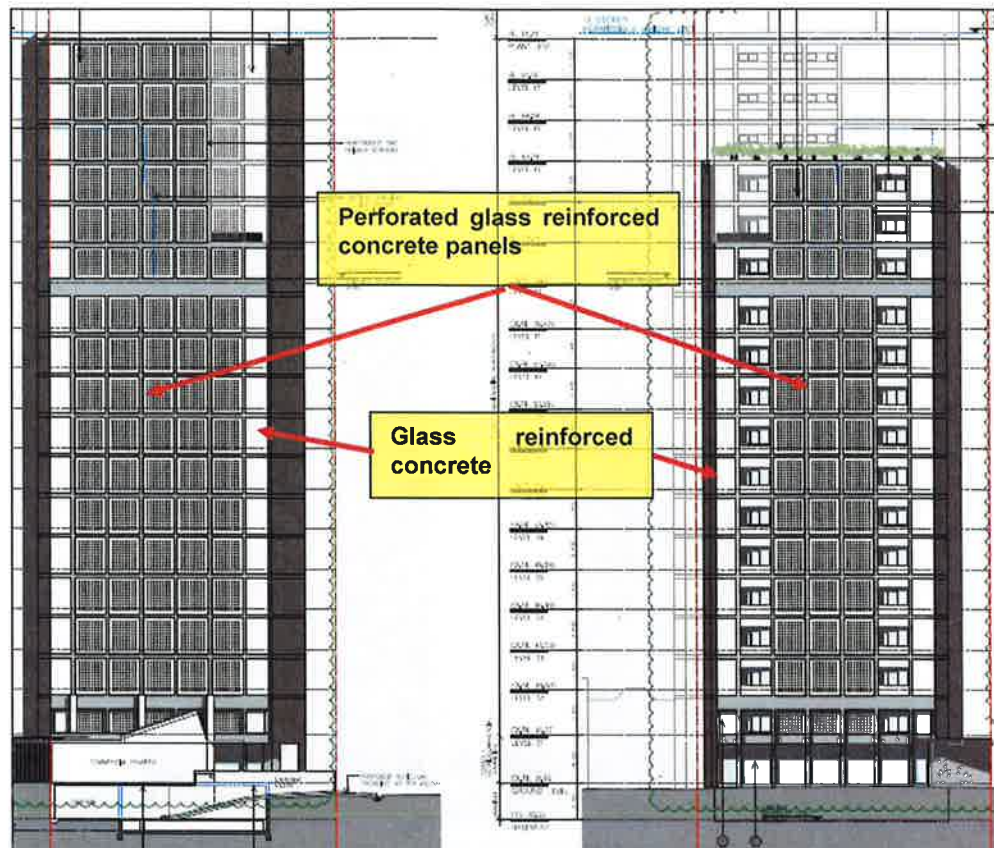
Eastern and western elevation of Tower 1 approved under MOD 2 (Source: MOD 2)
